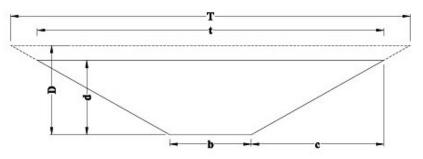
Trapezoidal Cross-section. (Source: Murty, 2009)
